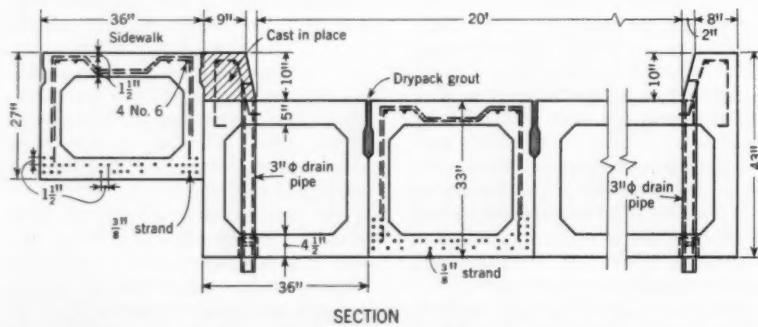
Cross section through deck shows how standard beams were assembled in 72-ft spans. Note longitudinal shear grouting between beams.
